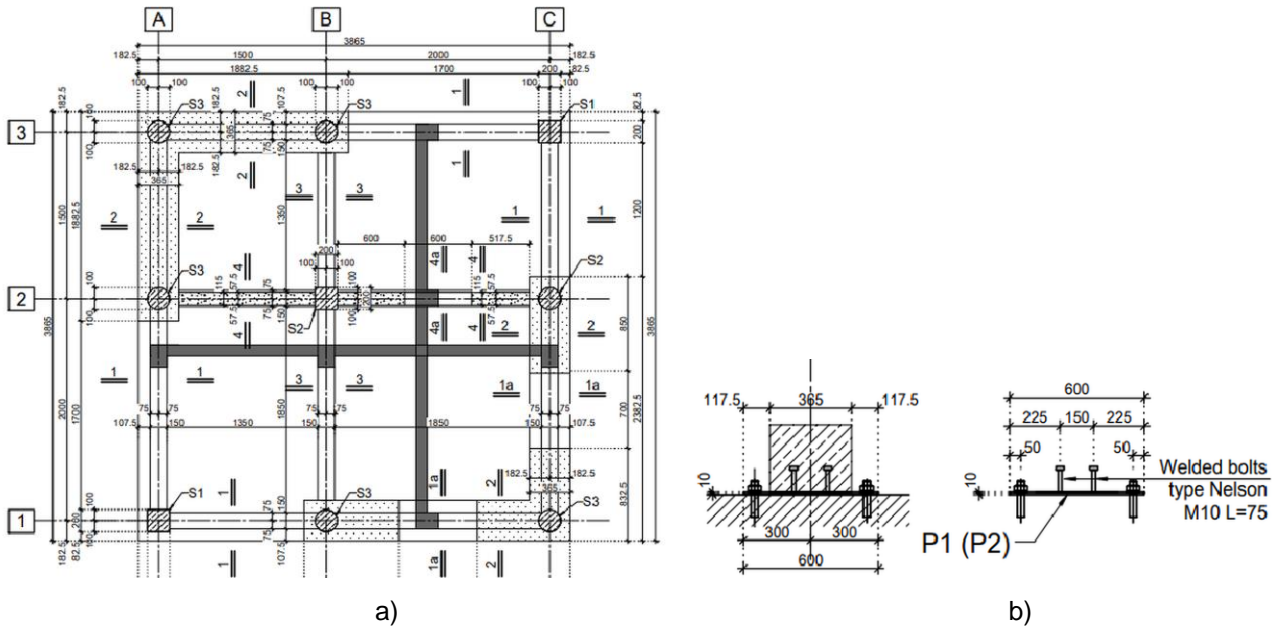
a) Plan layout ground floor; b) Section through foundation beam
